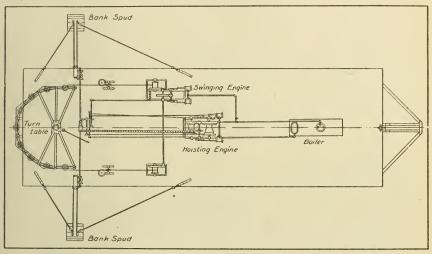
Plan of dredge, with stationary turntable and independent swinging engine.
